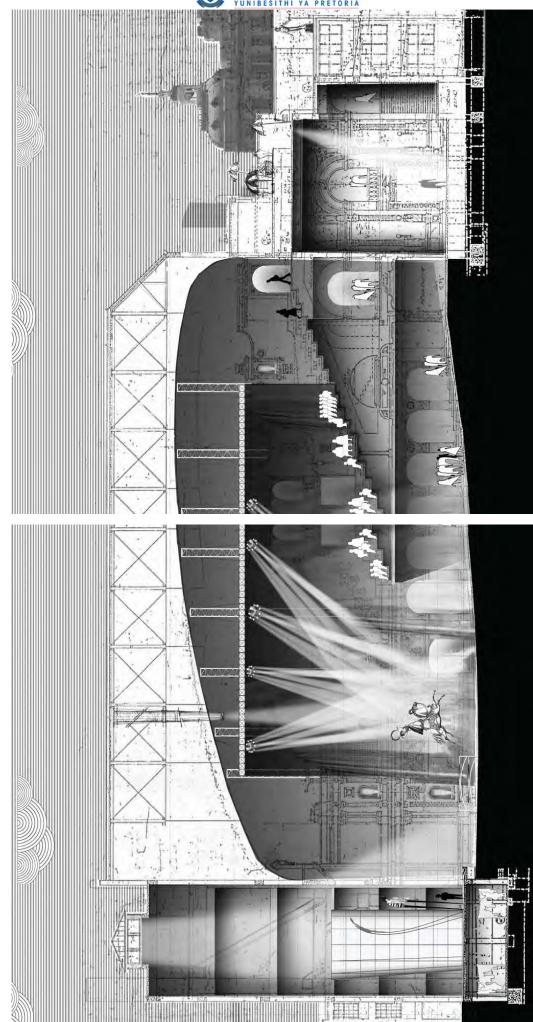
Section B-18 through auditorium, illustrating ribs, stage and backdrop, use of textile skin, lighting and trass suspended from ribs as well as floor system extending the skin | 134/
